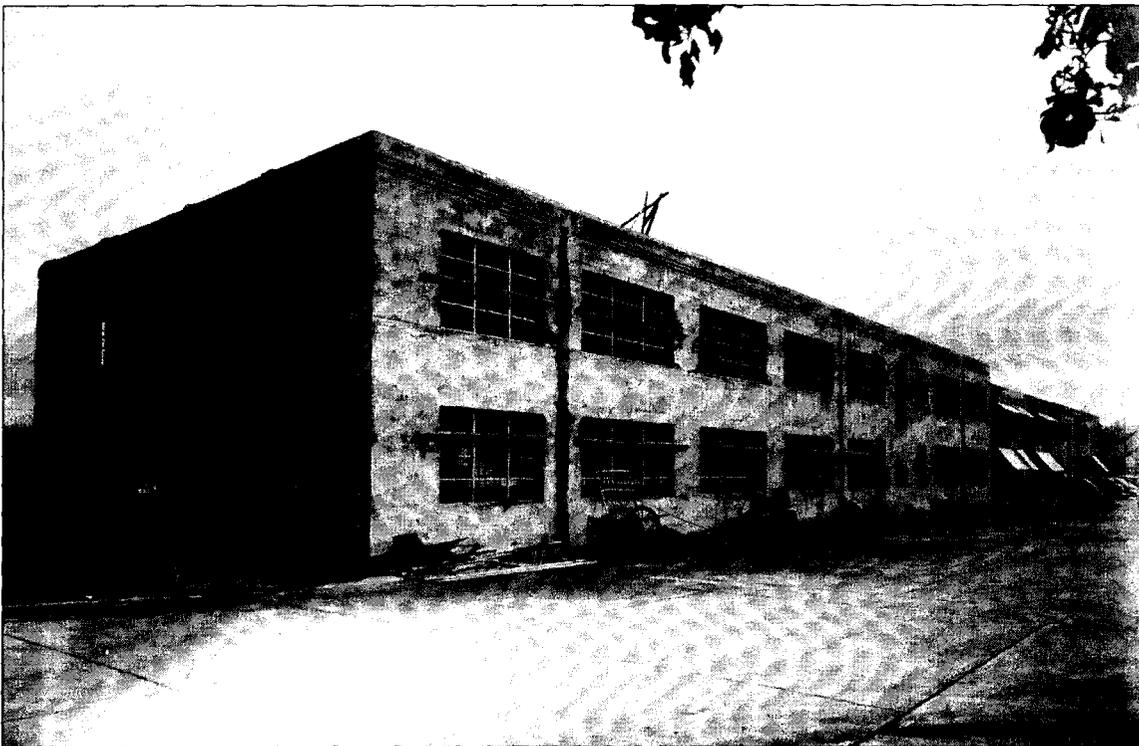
Construction of Building 73 addition on April 28, 1941; view to the northeast. Original image located at Command Staff Code OOTMA, Naval Undersea Warfare Center Division, Keyport, WA.
